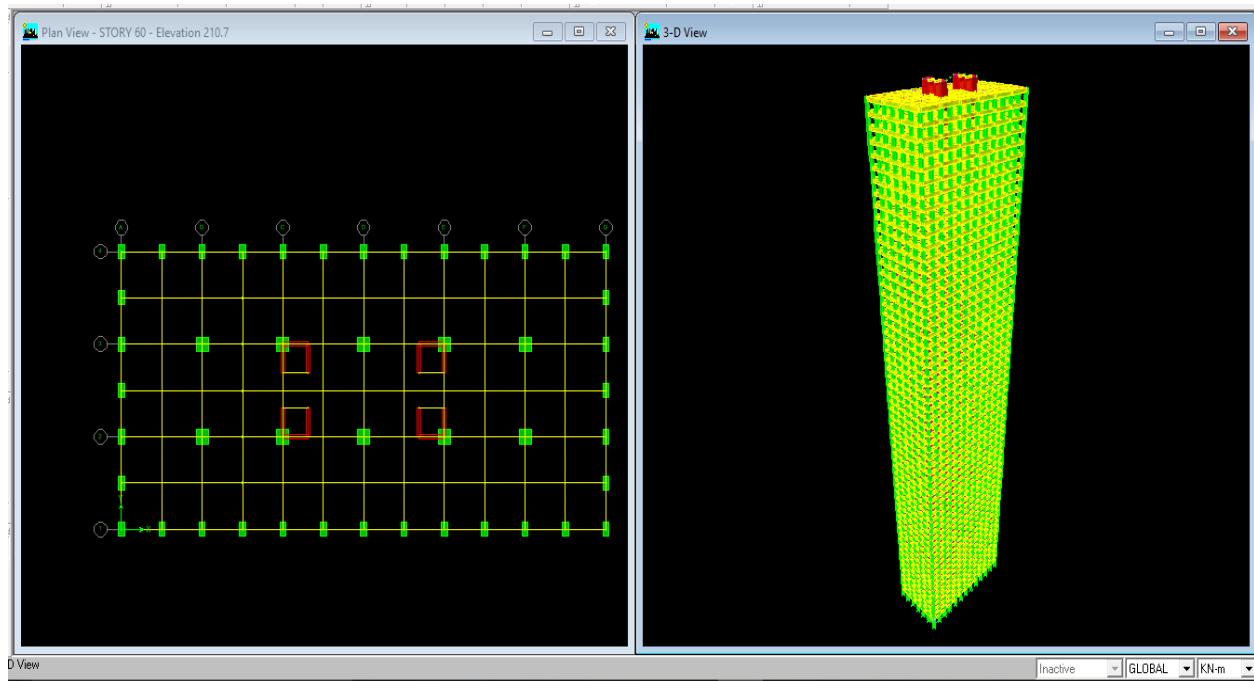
Plan view and 3-D view of 60 storied Framed Tube structure building
